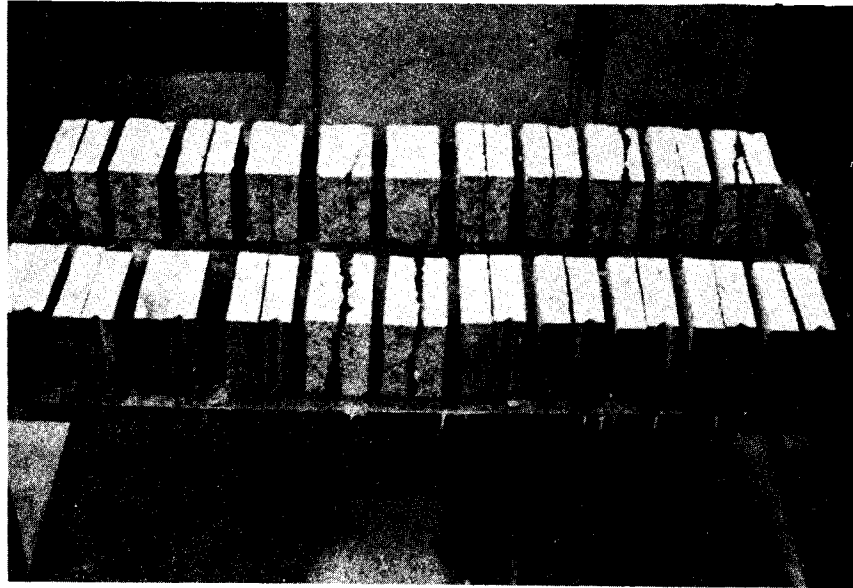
Some of the specimens subjected to shear and tensile tests loadings. Full-depth specimens are in center.
